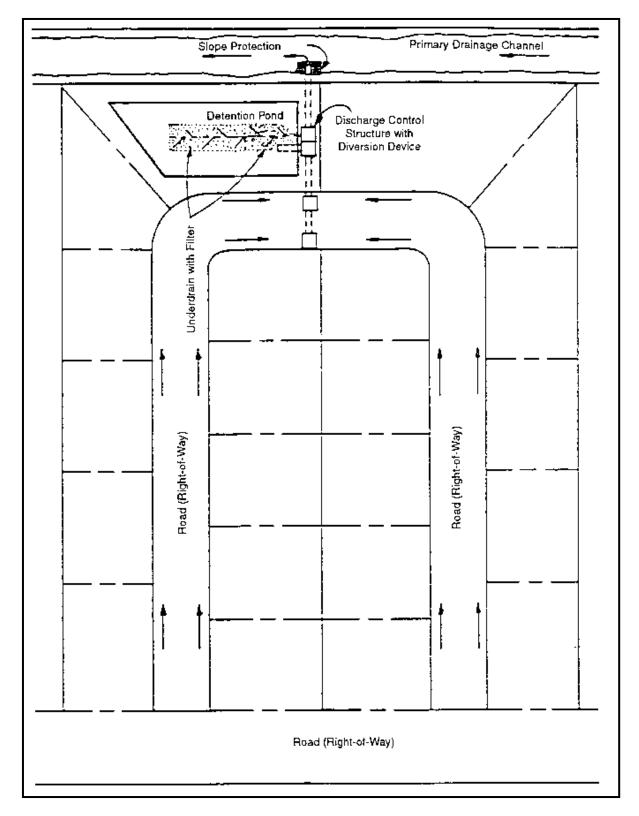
Typical Subdivision Layout Showing Off-Line Detention Pond and Outfall
